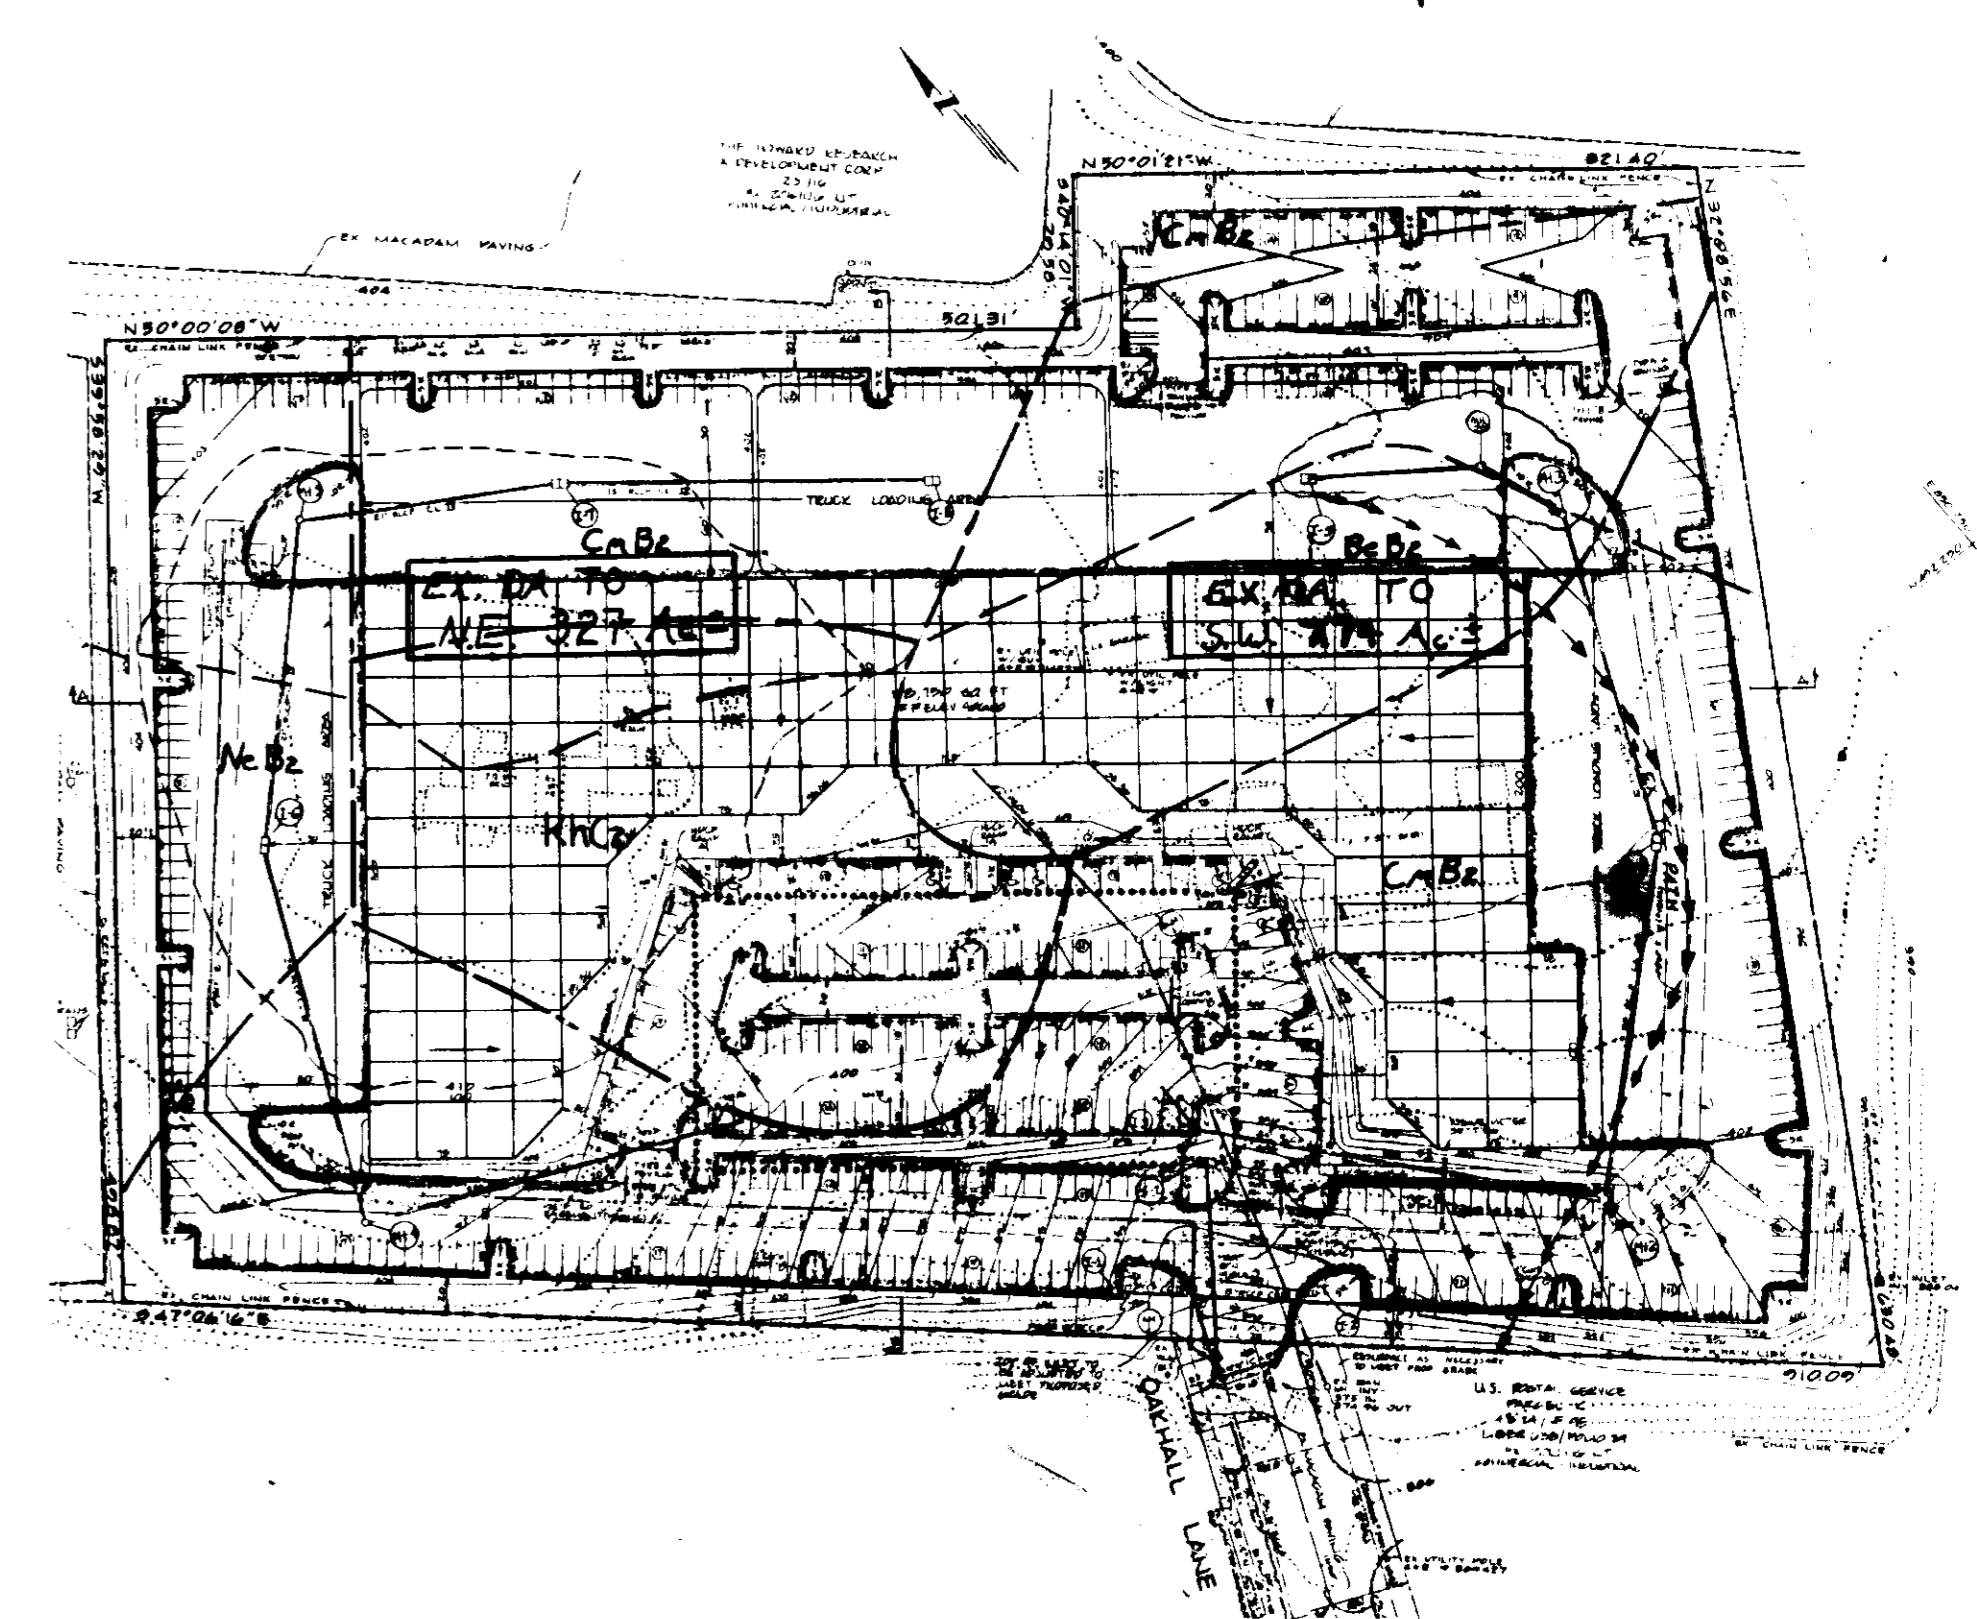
DETAIL OF UNDERGROUND STORMWATER MANAGEMENT FACILITY
